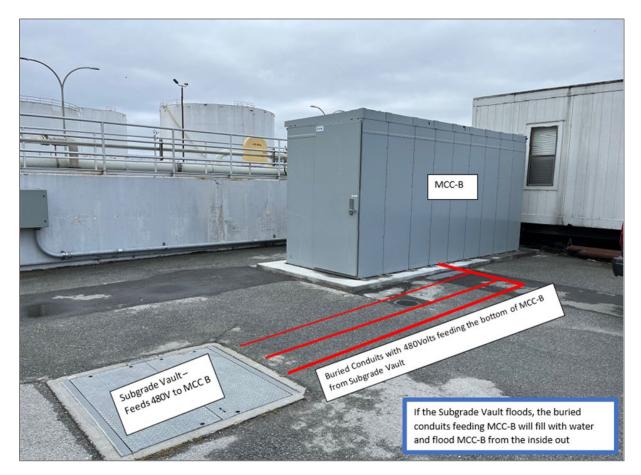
Photo of one of the eleven Motor Control Centers (MCC) at the WQCP, which each have buried conduits connecting through a subgrade vault. These conduits are vulnerable to flooding and could funnel water to the MCCs, which power various facilities throughout the plant.
